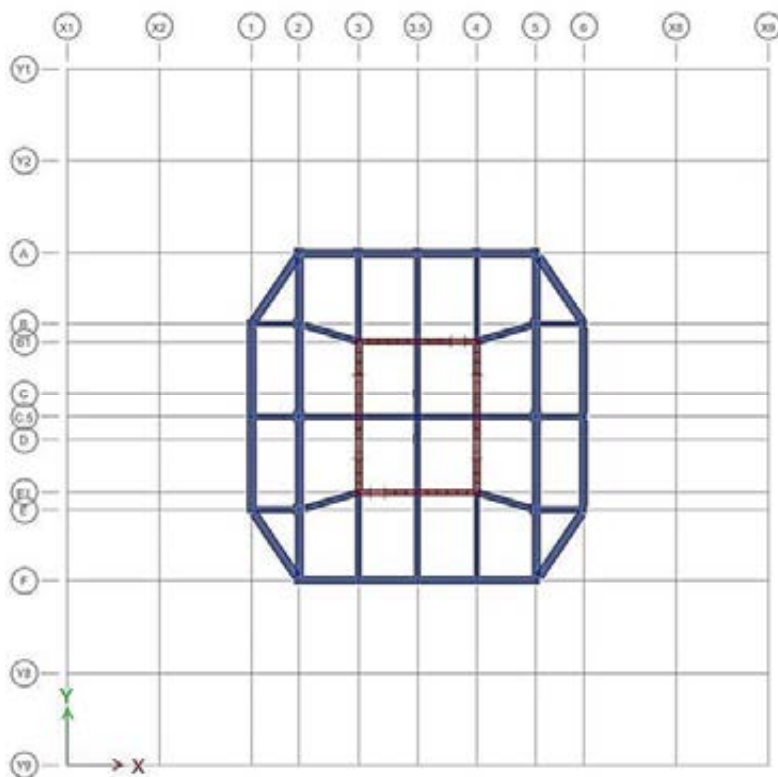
Typical plan view (Level 2 ~ Roof)
